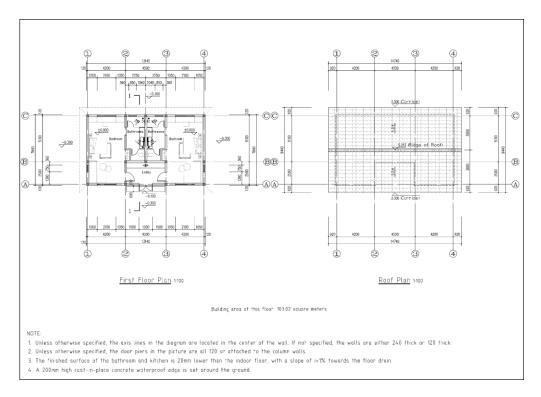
The First Floor Plan and Roof Plan of Sample Guest Room No. 1 (Drawn by the author)
